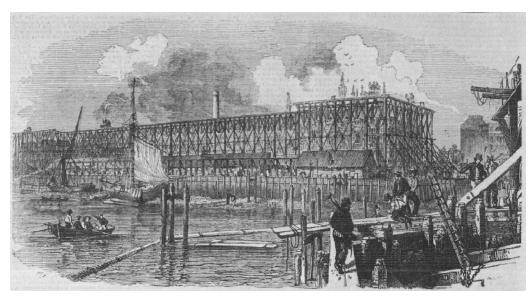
The New Houses of Parliament under construction London Illustrated News 25.6.1842
